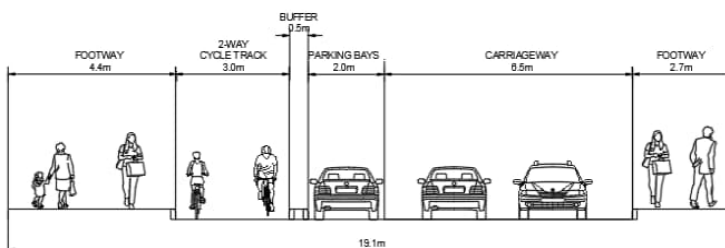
Two-Way Segregated Cycleway Cross-Section
